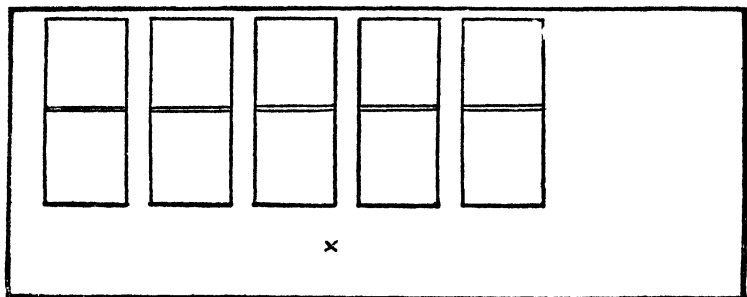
Proper location of windows for conditions named: lower part of the windows, four feet above the floor; distance from floor to ceiling, twelve and one half feet; top of windows, twelve feet above the floor; windows, three and one half feet wide; mullions (supports between windows), one foot wide; distance of rear window from rear wall, eighteen inches; distance from front end of room to first window, nine feet. The cross marks the center of the schoolroom population.
